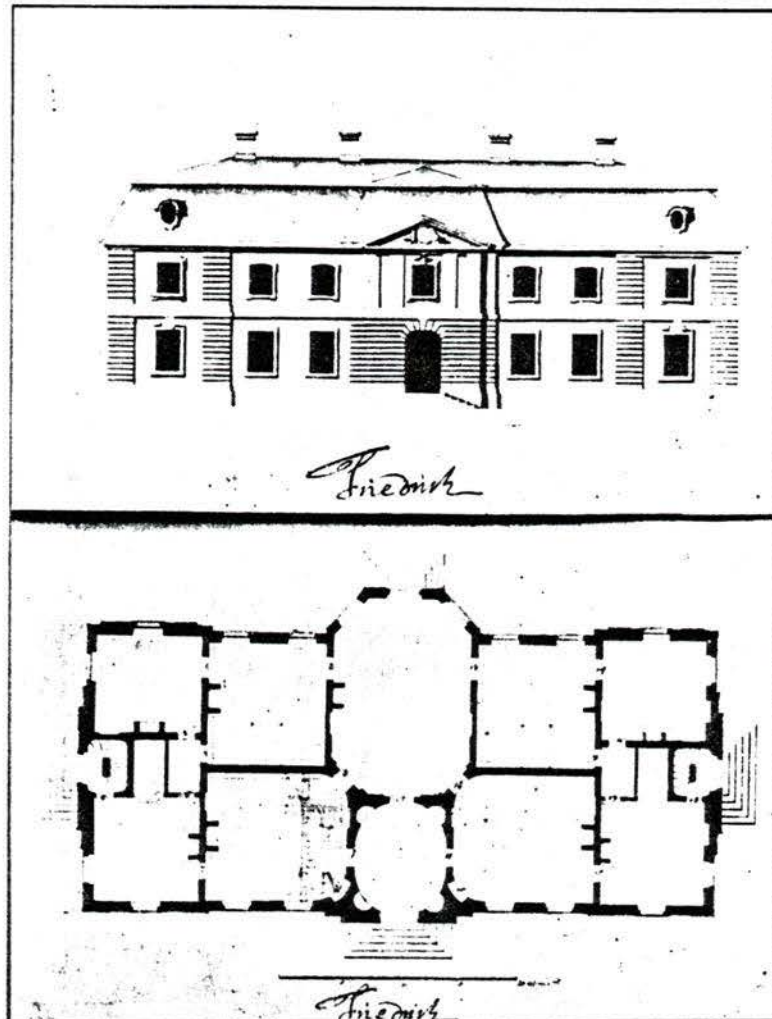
Svartsjö, Uppland. Façade and floor plan.
